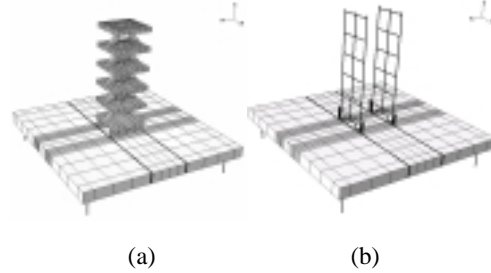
Five story shear wall building:(a) Transverse floor and bracing system, (b) Reinforcements of shear walls.
